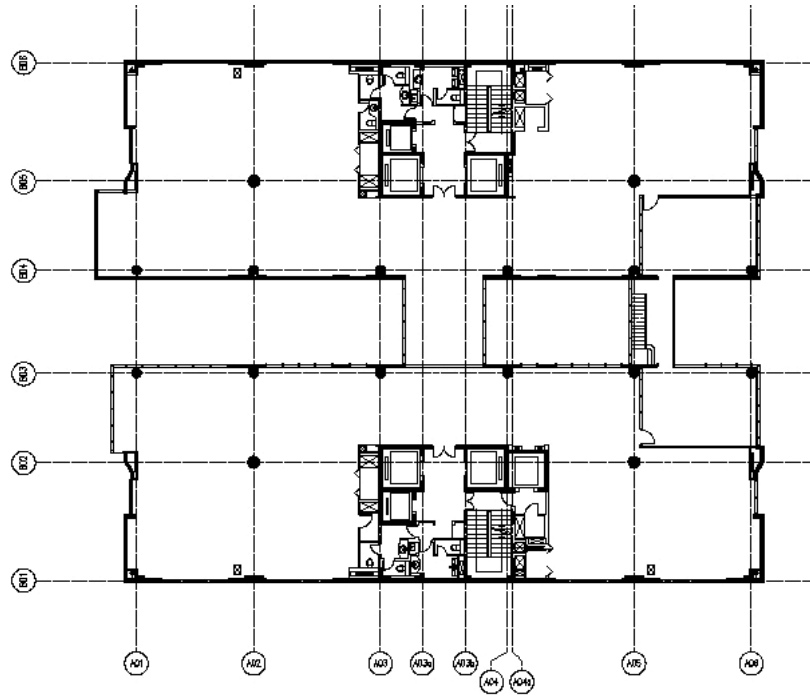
Birla Corporate Office, New Delhi: Seventh Floor Plan
